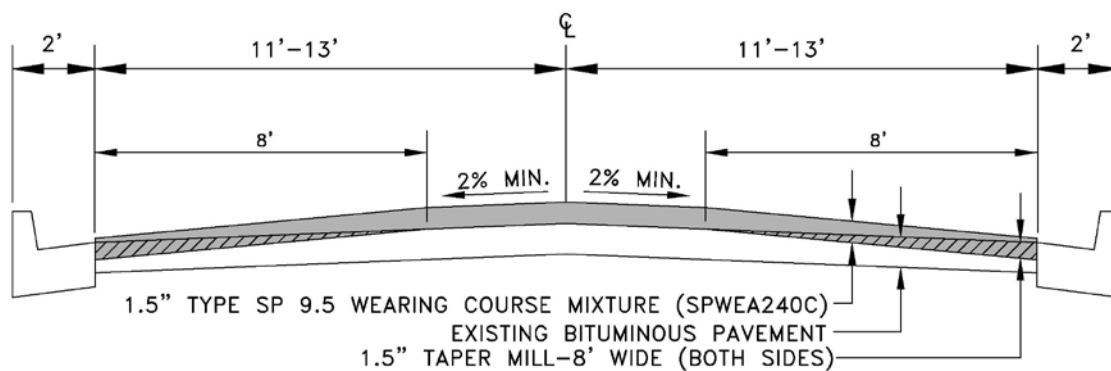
Residential Overlay with Curb – Bituminous Overlay Typical Section
